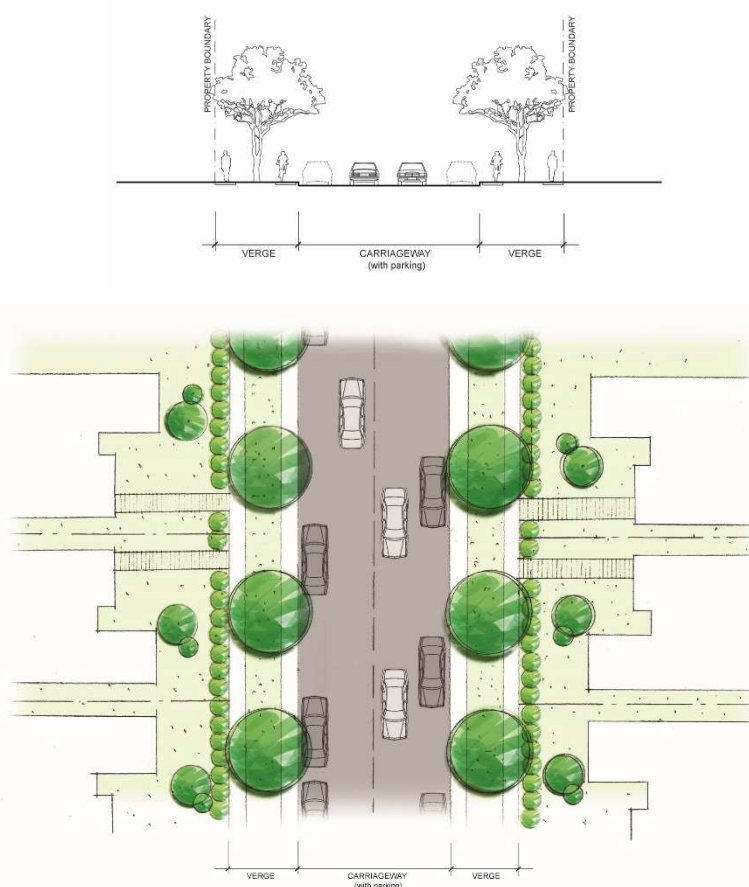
Indicative Layout of a Two Lane Sub-Arterial Road
